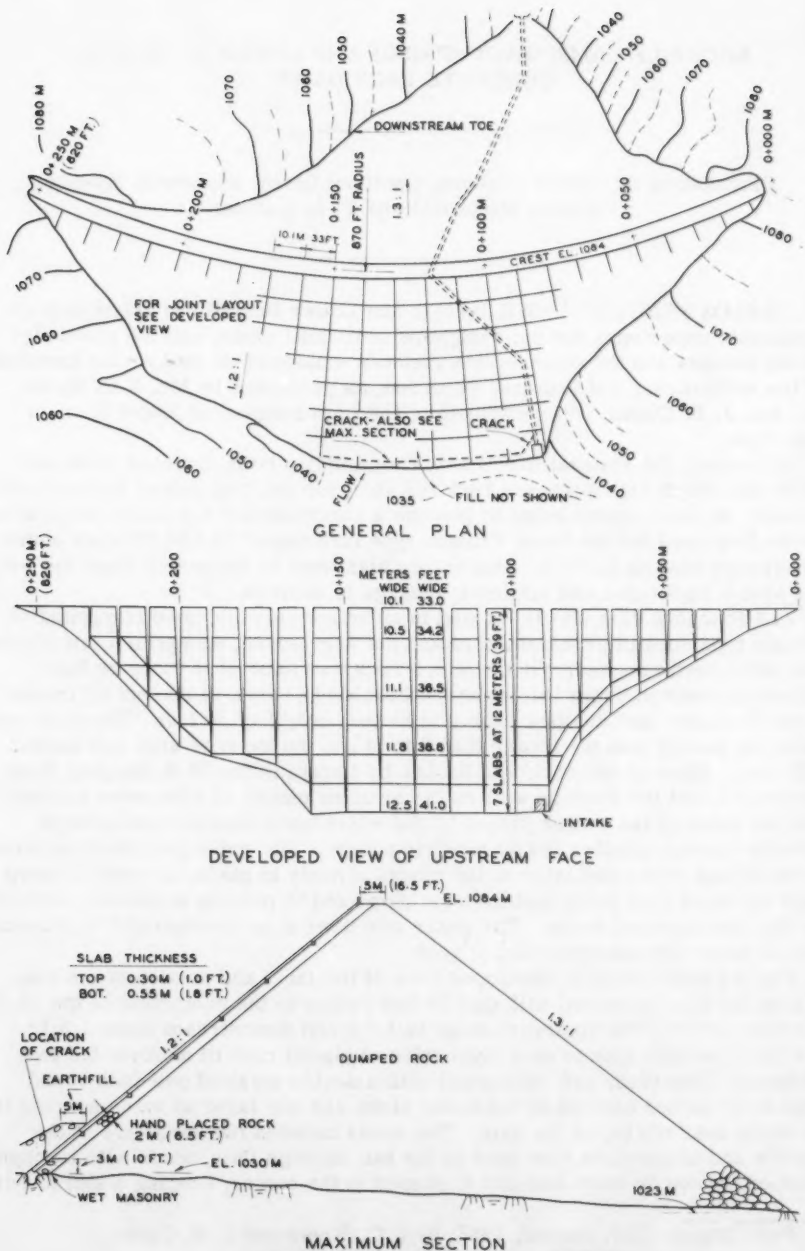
PLAN VIEW AND SECTION - PINZANES DAM
